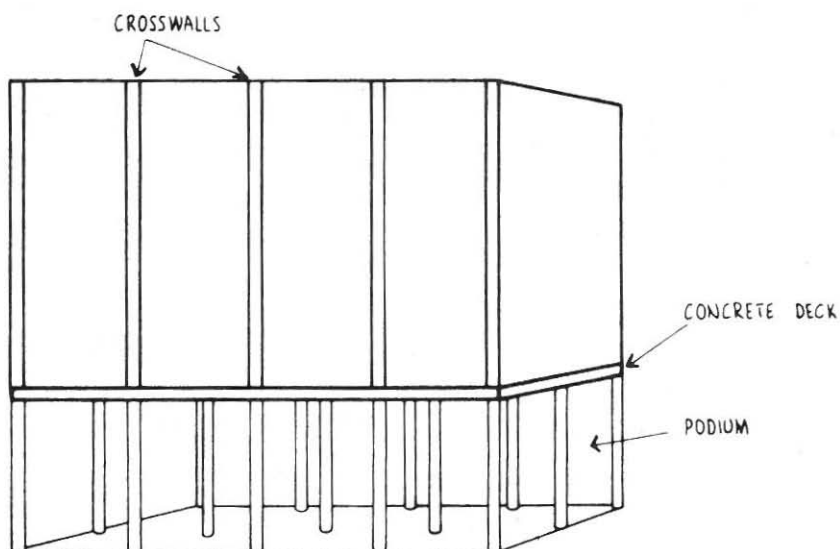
PODIUM AND CROSSWALL CONSTRUCTION.
